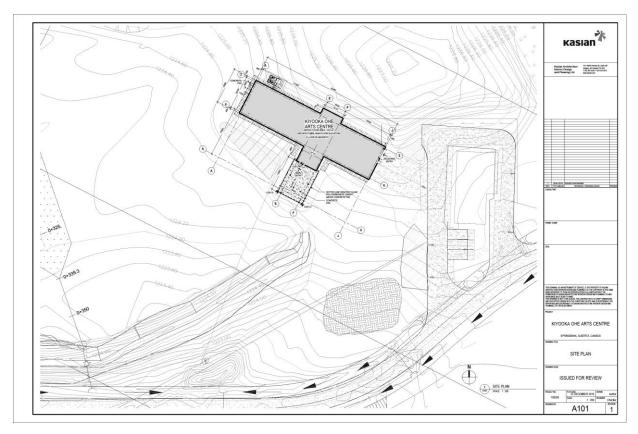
PROPOSED PAVILION (SITE PLAN)
